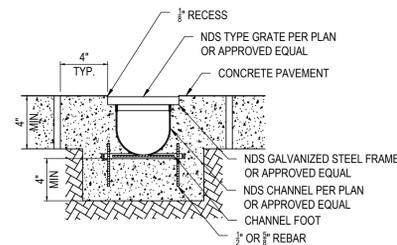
DETAIL BUILDING DRAINAGE 4 NOT TO SCALE
